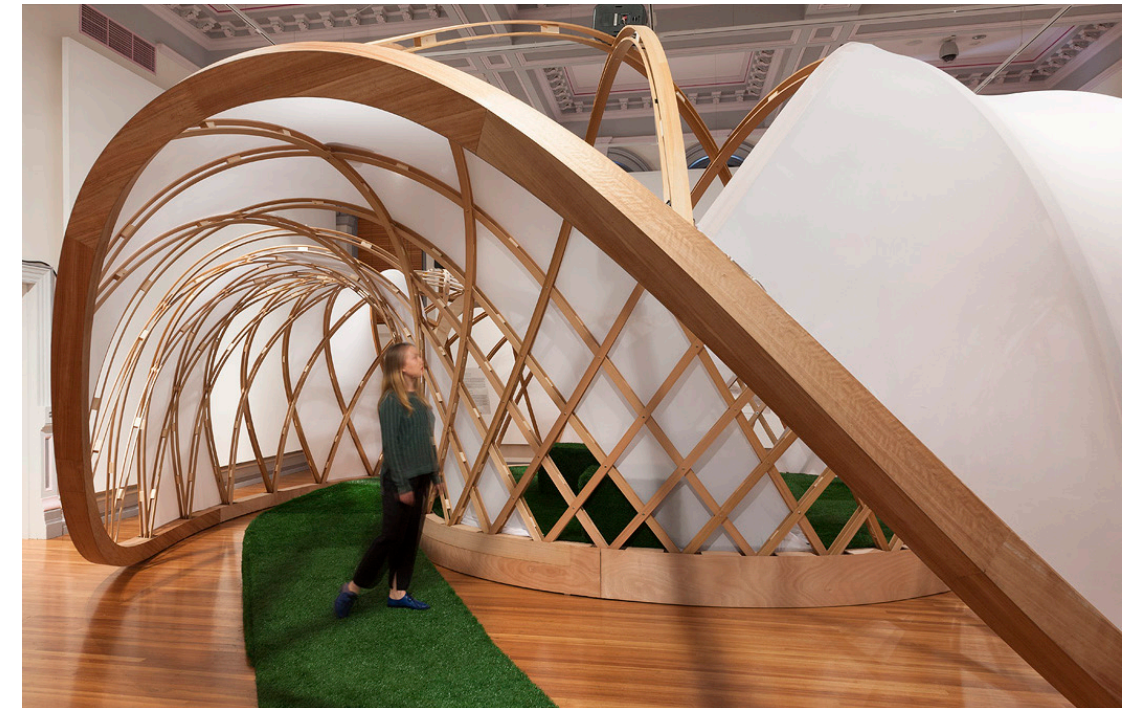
The installed structure with major entrance under the cantilevered edge beam.
